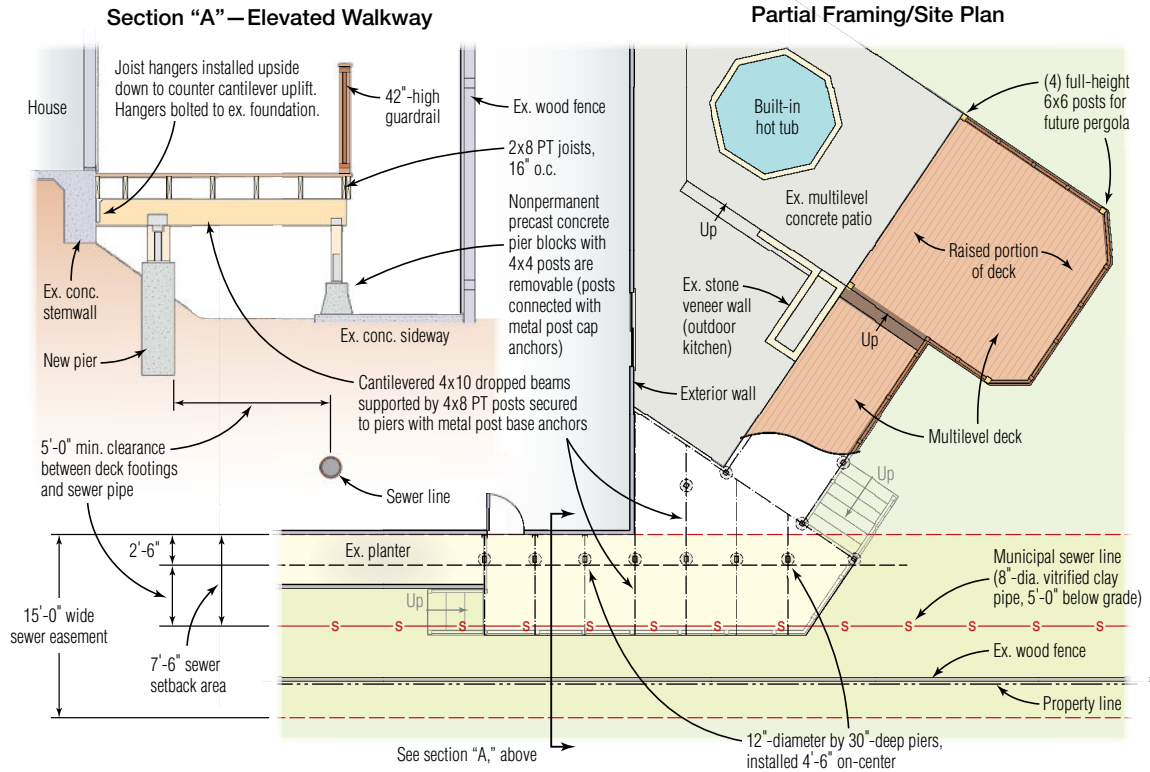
Because of an existing sewer easement (see illustration, above), footings for the elevated walkway along the side of the house could be placed no closer than 5 feet from the municipal sewer line (A, B). Thirty additional piers were also needed to support the main part of the deck, which was designed to extend an existing concrete patio (C).
